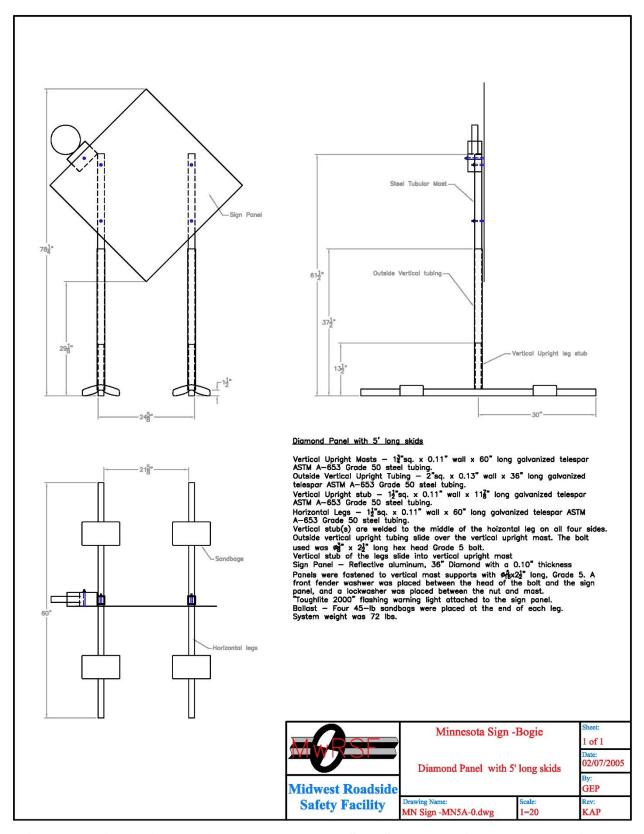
36-in. (914-mm) Diamond Work-Zone Sign System, Bogie Test No. MN5A0 (11)
